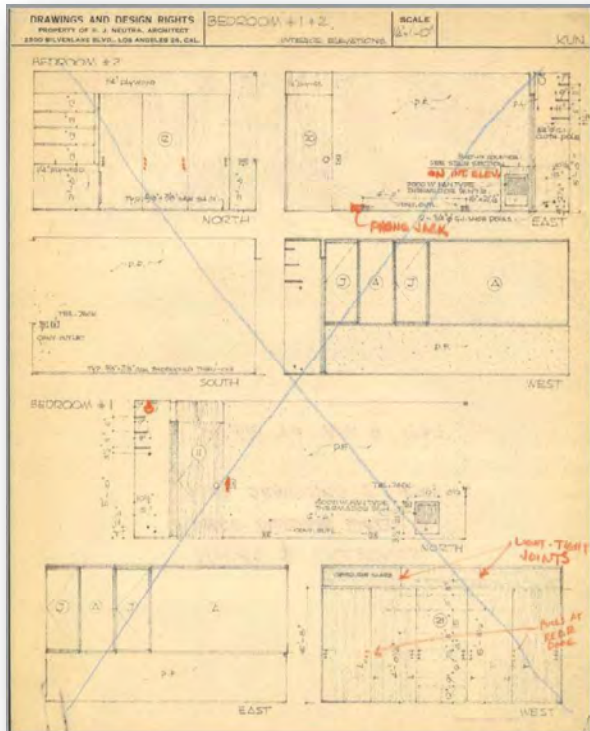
August 1949 speculative drawings for Kun House II's upstairs bedrooms (Source: UCLA Special Collections)
